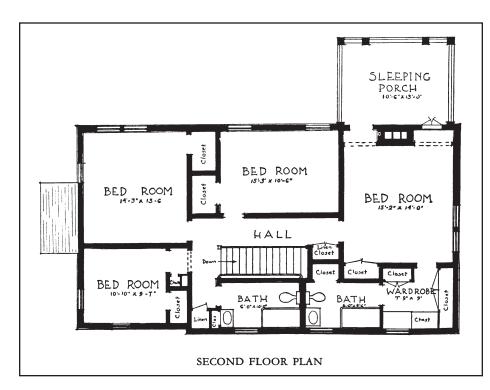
Second-floor plan of the Cleaves house. From *House Beautiful*, November 1922.
